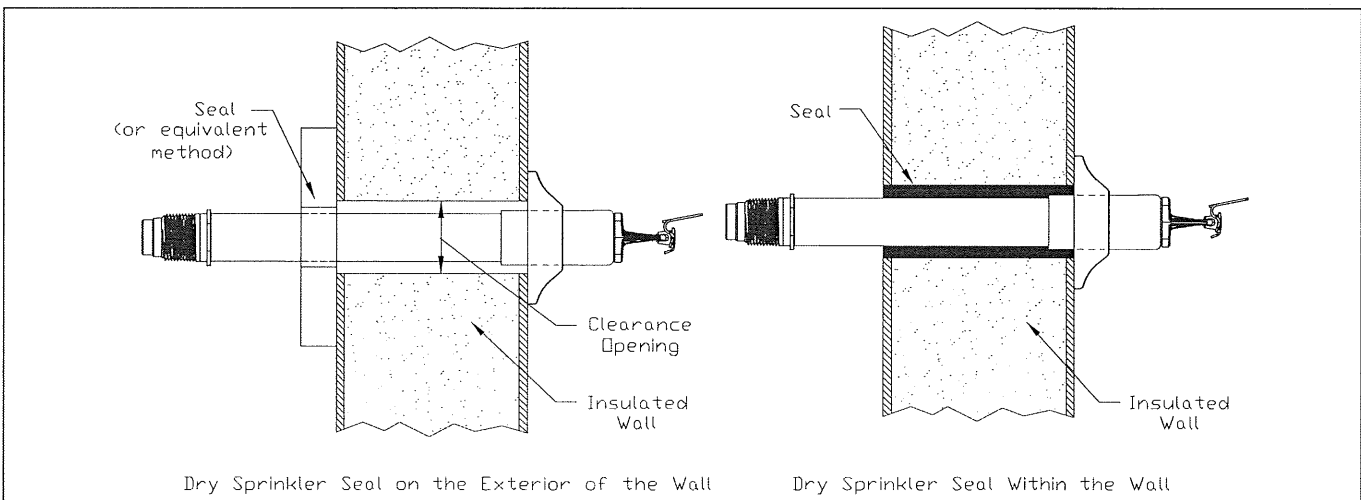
Dry Sprinkler Seal (Adjustable Standard Dry HSW Sprinkler is Shown)
